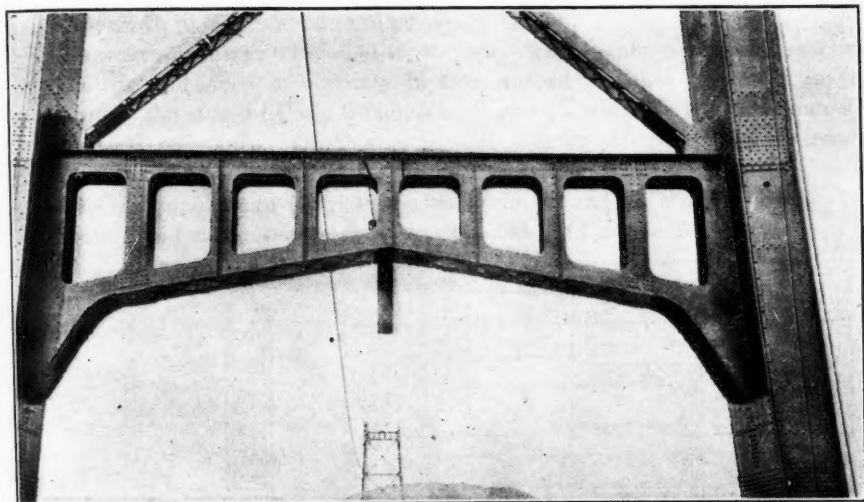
TRANSVERSE PORTAL GIRDER IN TOWER, FLORIANOPOLIS BRIDGE.
